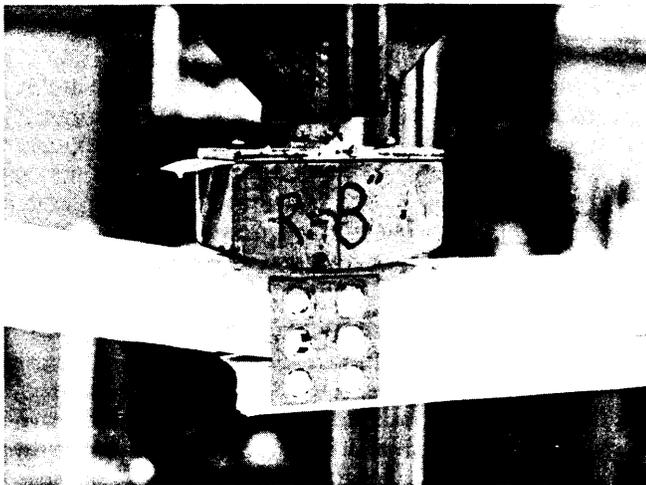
Plated notch failure mode in repaired stringers tested in bending.
